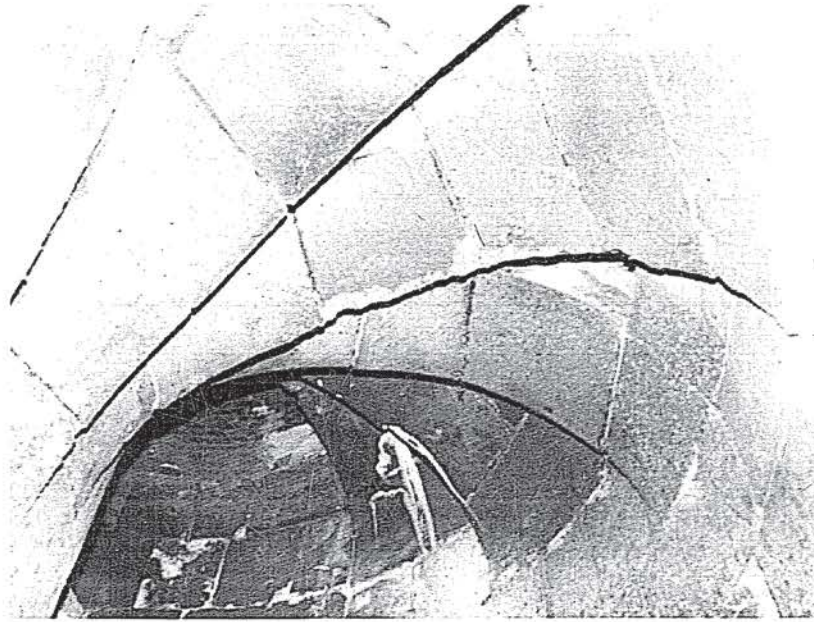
The detail of step underside of Erzurum Tray (Tepsi) Minaret.
